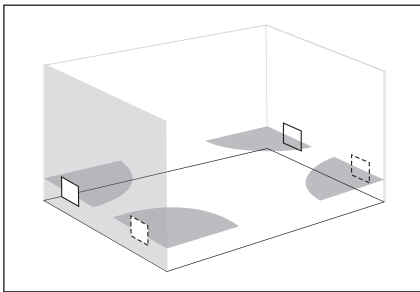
In Wall – Placement anywhere along the walls close to the floor, but outside the "shaded" area will provide slightly reduced output, though still acceptable accuracy.
